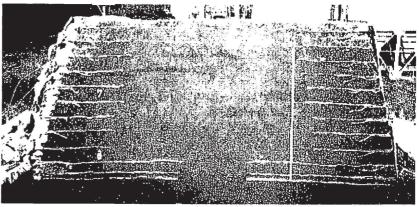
Cross-section including the right-hand and left-hand walls, exposed at demolishing, Chiba No.3 embankment.
